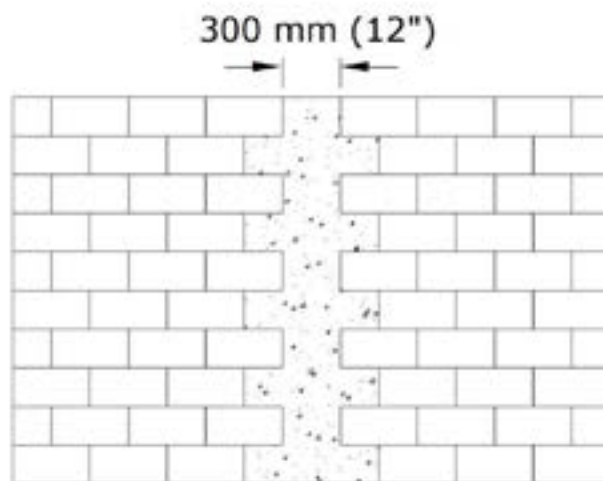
CONCRETE STIFFENER IN MASONRY WALL
